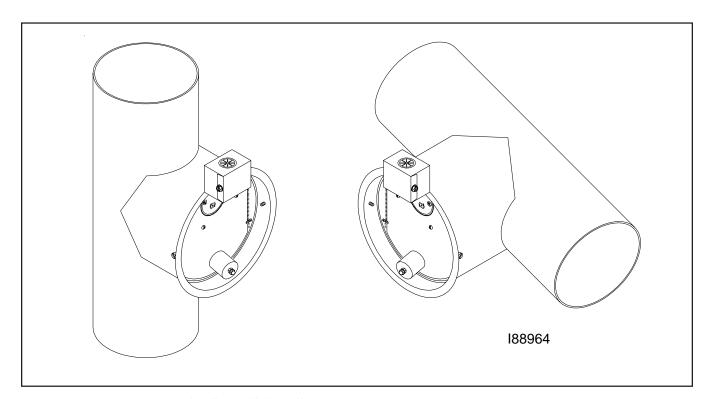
Stack Safety Switch Installed on the Barometric Damper
